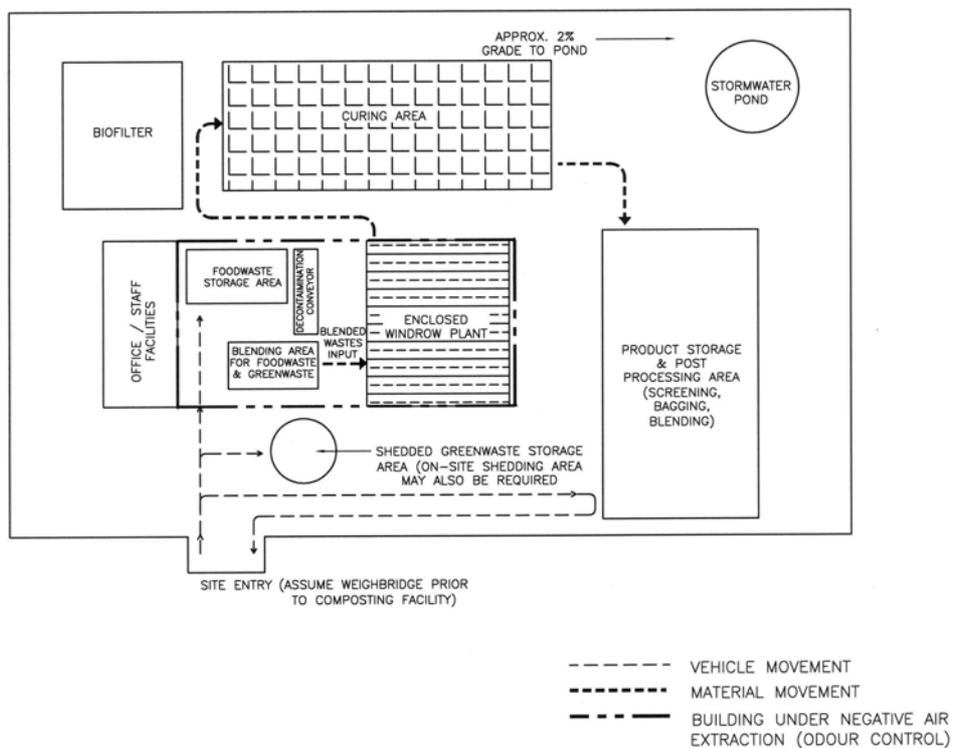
Enclosed Windrow Composting Facility Layout Schematic (not to scale)
